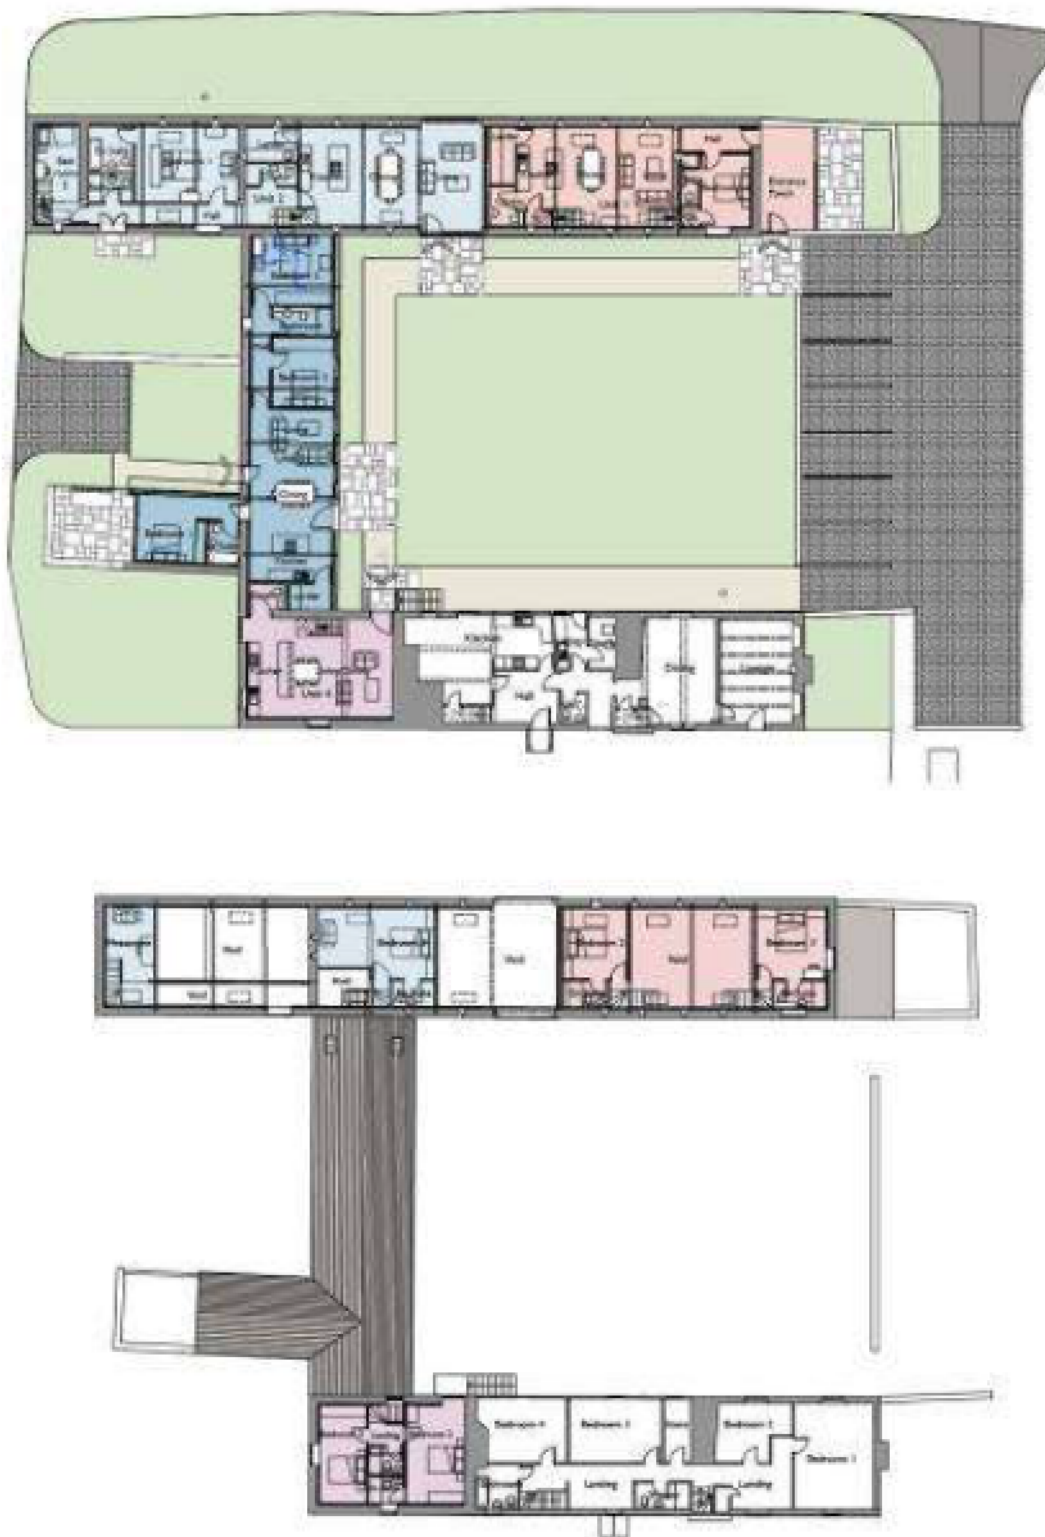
Ground floor (top) and first floor (bottom) plans for the proposed conversion works to the barns and granary at Warryfield Farm.
